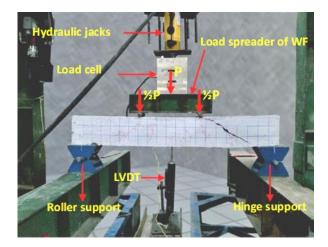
Test arrangement of bamboo-reinforced concrete beams.
